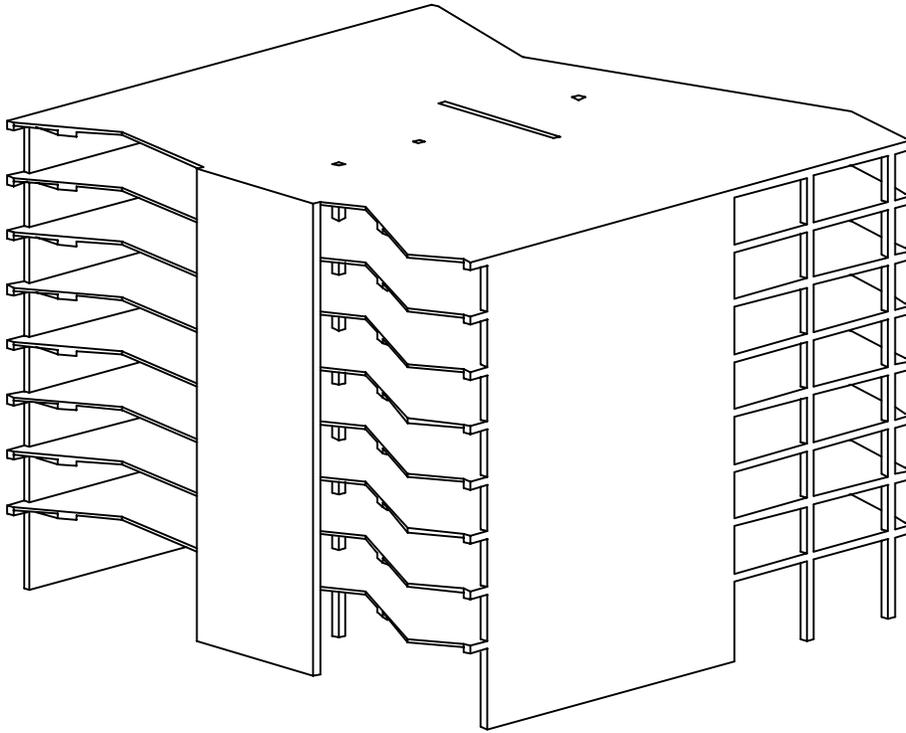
Eight-story reinforced concrete parking garage (partial view)
